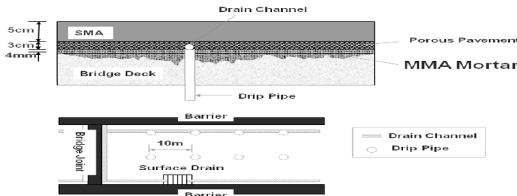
Section view and plan view of bridge deck pavements with the new drainage system installed
